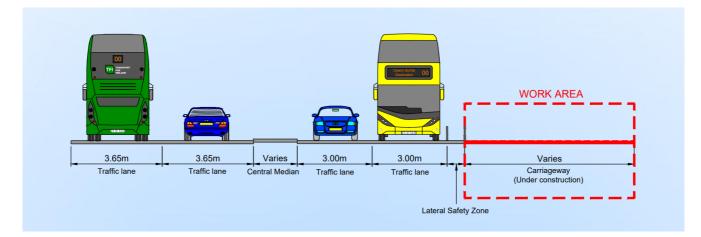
Traffic Management Cross Section, Section 2f - Stage 1
